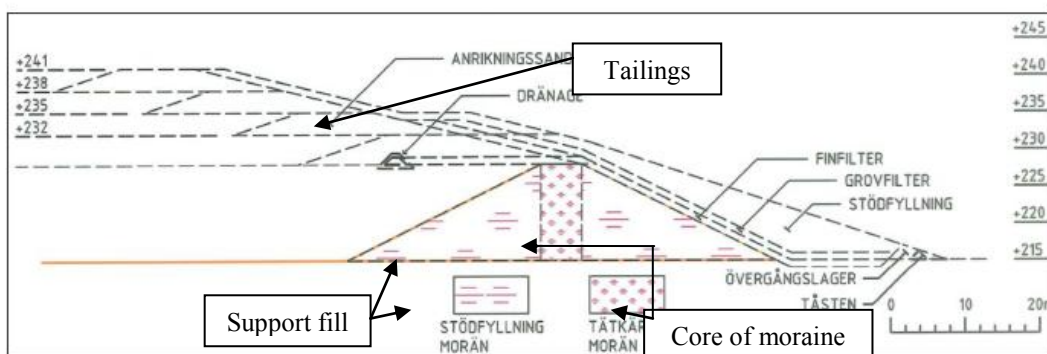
A cross-section of one of the tailings dam at Garpenberg (Wormeester ;2, 2011 p. 3).
